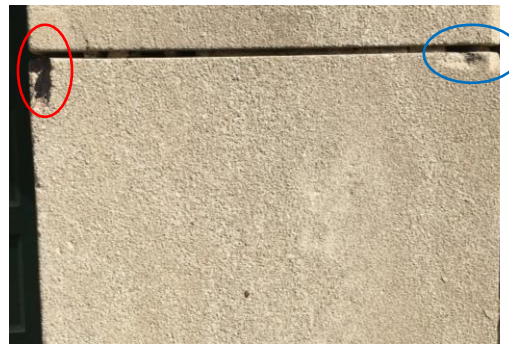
Example of an area to be patched on the east elevation of the stone pier base as indicated by a red circle. The blue circle indicates a spall that would not be repaired through patching. Note there is little to no mortar in the joint above.
